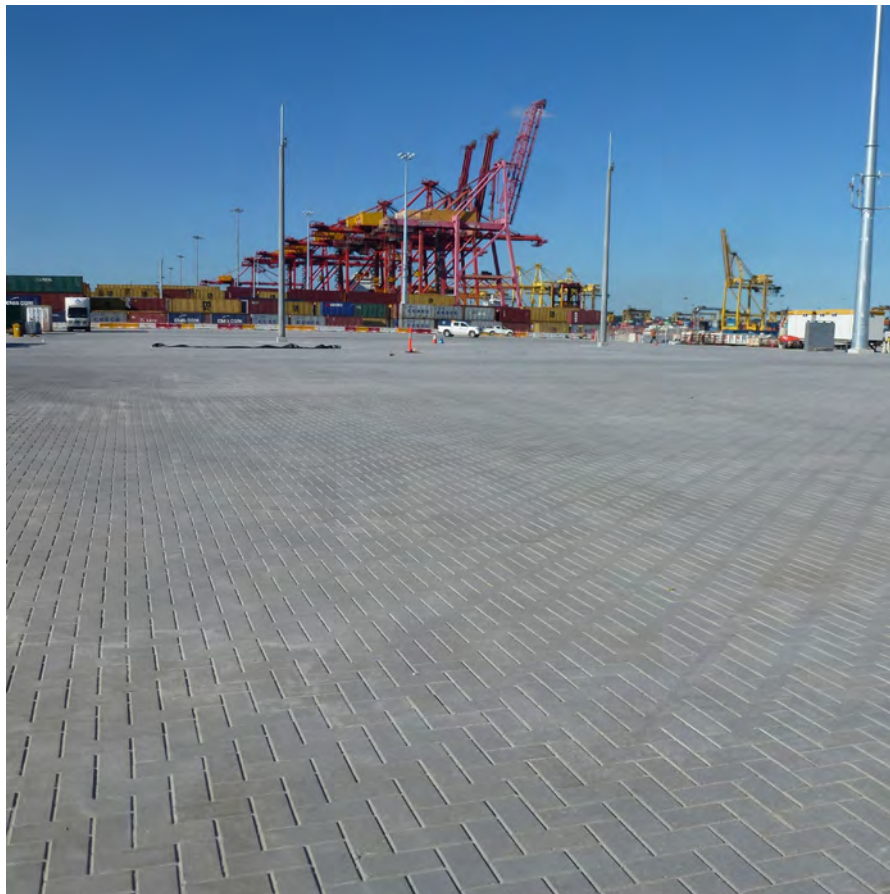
A 69,000 m² concrete segmental pavement was specified for a container facility at Port Botany in Sydney. The herringbone laying pattern provides additional strength to the pavement.
